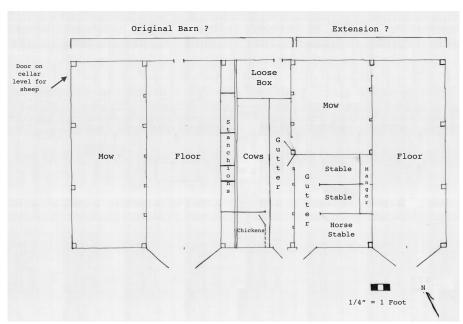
The Hattie barn, Hattie Rd., Glenelg, running WNW – ESE, 60x30 ft. The barn is a five-bay asymmetrical form. Framing evidence, such as notches for a missing collar beam, a sawed horizontal rail, and a large central post placed at what may have been the ESE gable end bent of a three bay barn suggests the barn was originally an English form. Further, two floor joists placed very close together below the barn correspond to the bent with the missing rails above. A half mow and half stable bay, and a floor bay, would have been added later to make the current five bay structure. However, the owner, Cecil Hattie, insists the barn was originally built "as is." More concrete evidence revealed in other extended St. Mary's barns—such as two rafters placed close together, two adjacent posts, or a knee brace bolted into the last post of the old frame—would make the spatial evolution of this barn less of a mystery. Plan by author and Adrian Morrison. Drawn by author.
